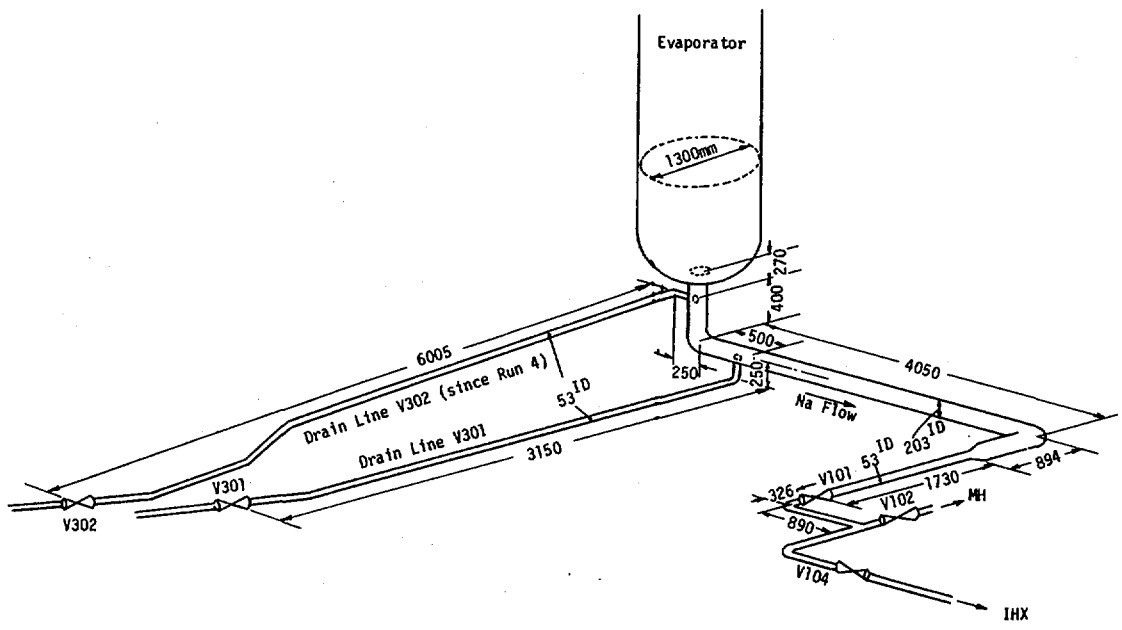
Schematic Diagram of Sodium Outlet Piping and Drain Piping of Evaporator
